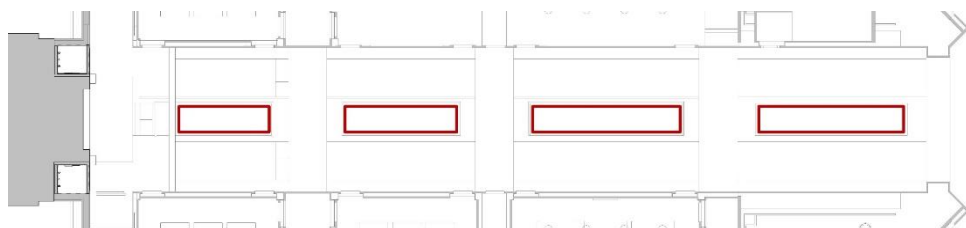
Capitol Extension Corridor Reflected Ceiling Plan
